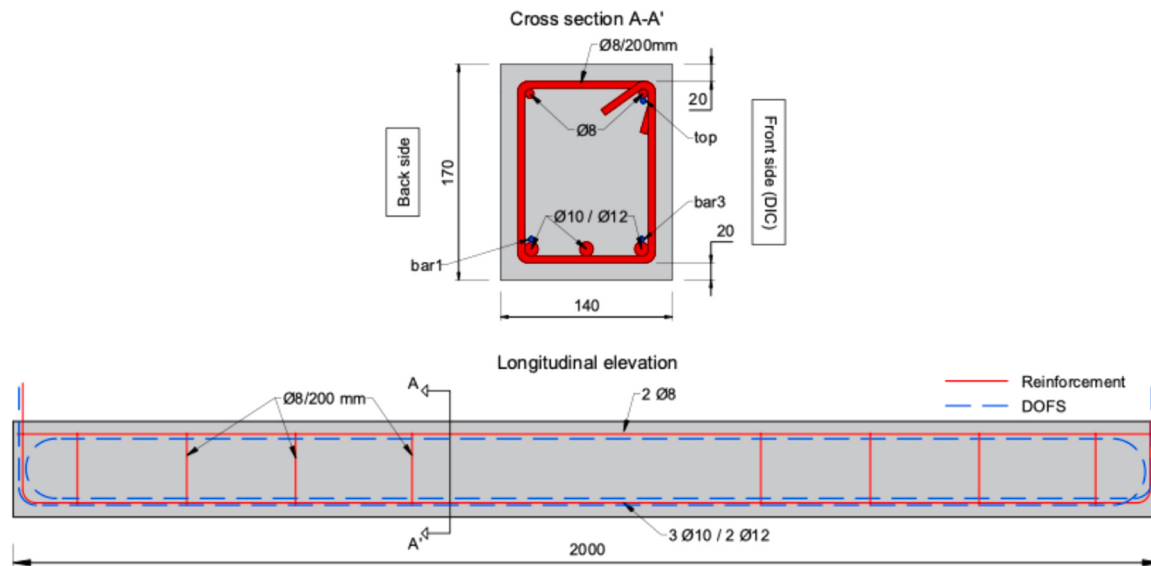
Reinforcement layout, DOFS configuration and geometry of the beam specimen (all measurements in mm).
